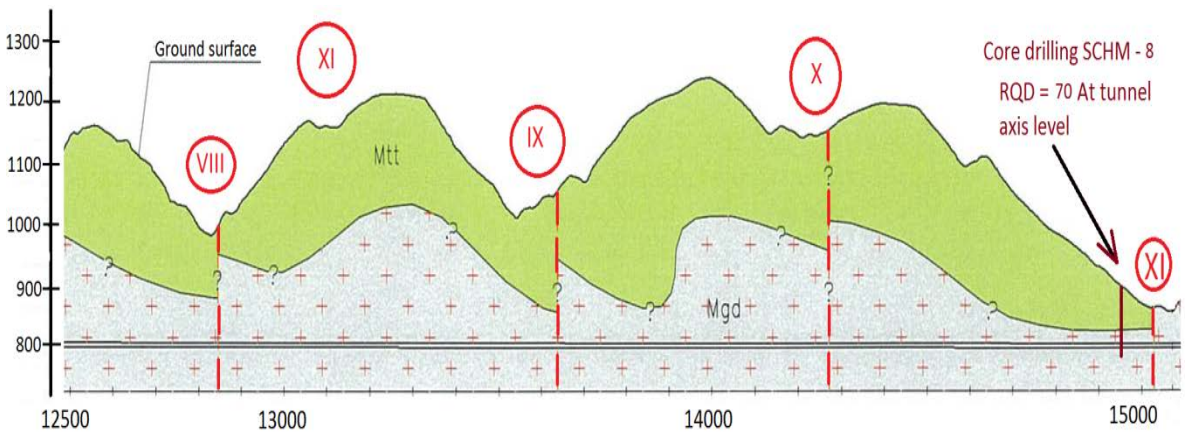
Vallical tunnel longitudinal profile Chainage 12,500 – 15,100 m.
